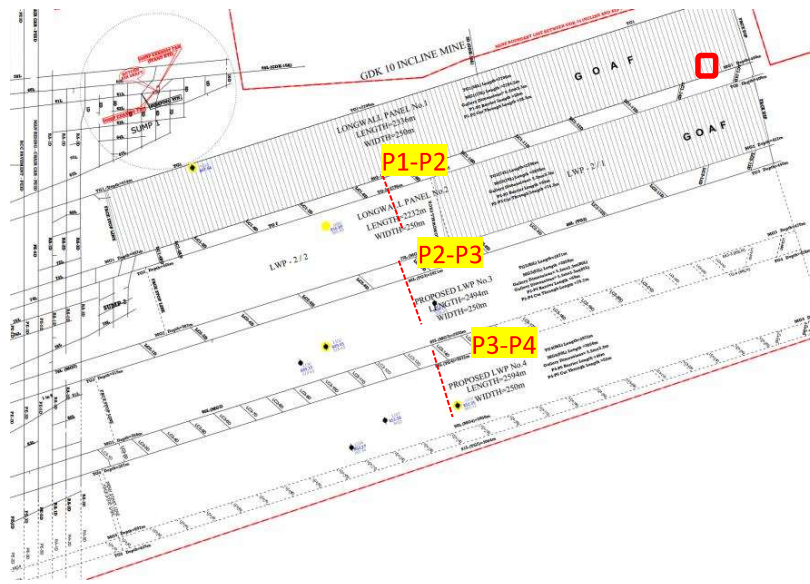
Layout of the mine plan of the Adriyala Longwall Project (ALP) site
